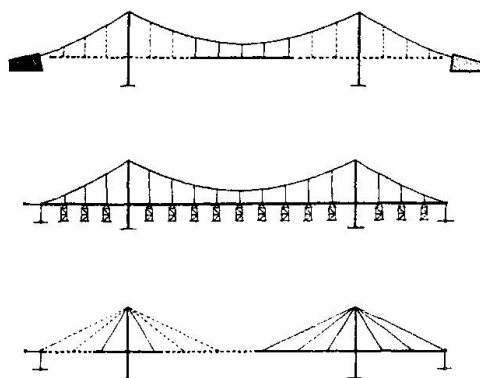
The earth-anchored suspended girder needs abutments but can be built without falsework. The self-anchored girder needs temporary falsework but avoids horizontally loaded foundations. The cable-stayed girder combines both advantages.
